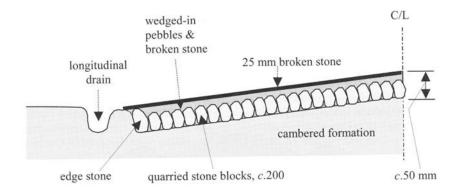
Typical Trésaguet Pavement (Lay 2009)
